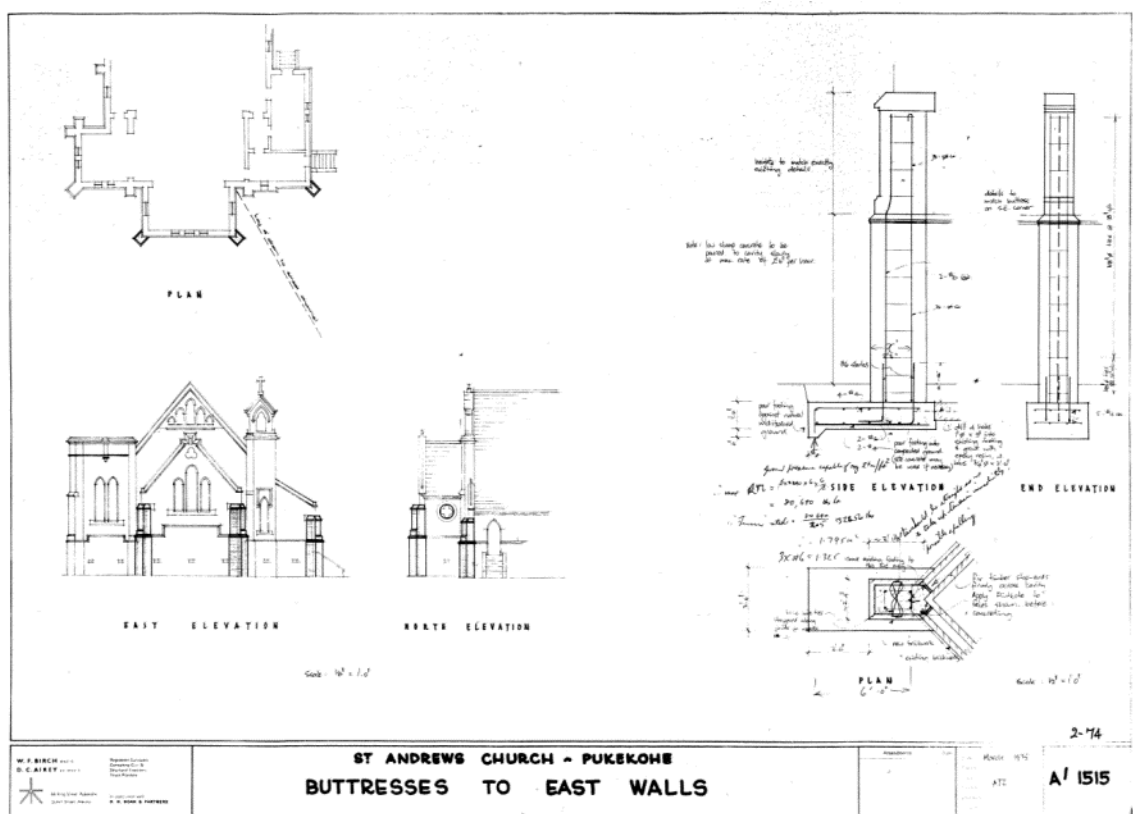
Plan, elevation and section drawings showing the buttresses proposed to the east walls, 1975 (Auckland Council property records).
